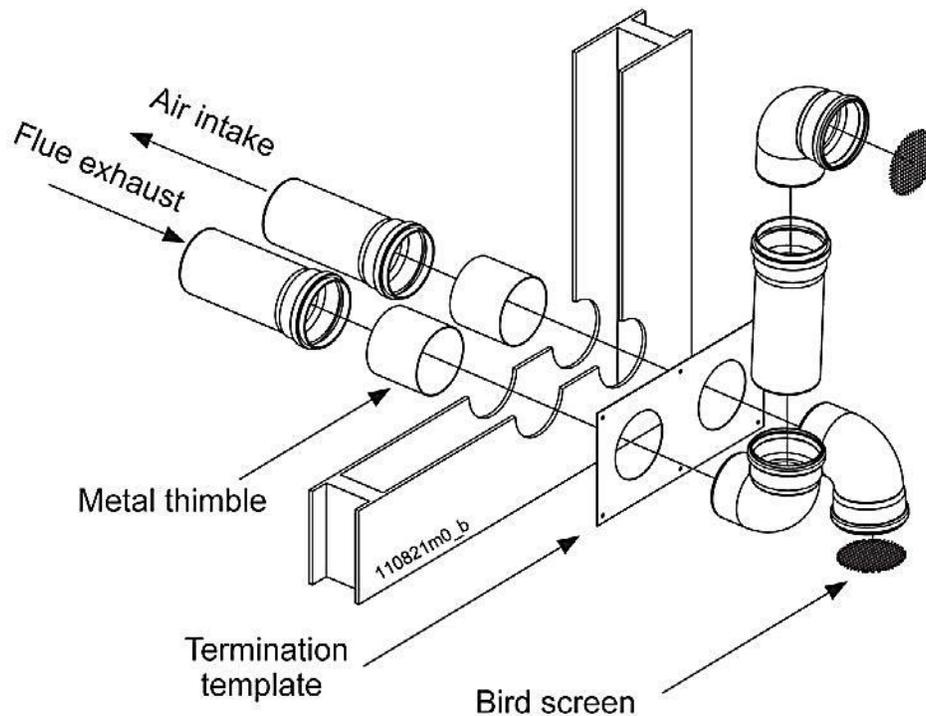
Separate Air Intake and Vent Pipes Sidewall Termination
